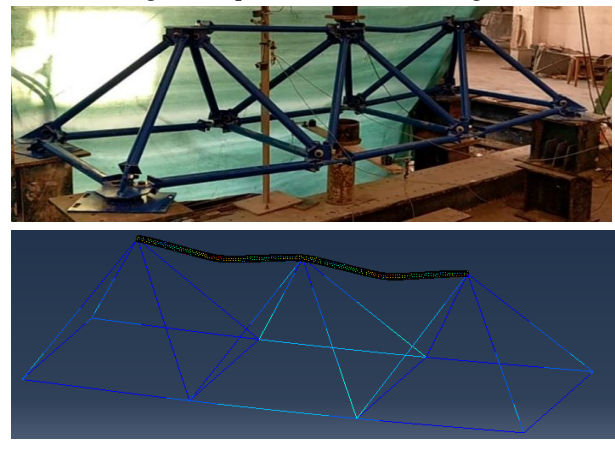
F.E. Modelling and Experimental Deformed Shape of Steel Space Truss ST2.
